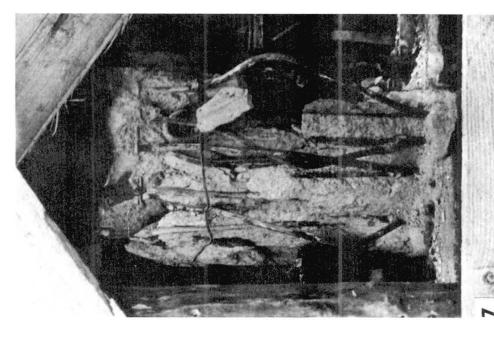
, 22- Typical crack in bearing walls (build in the '30's)
